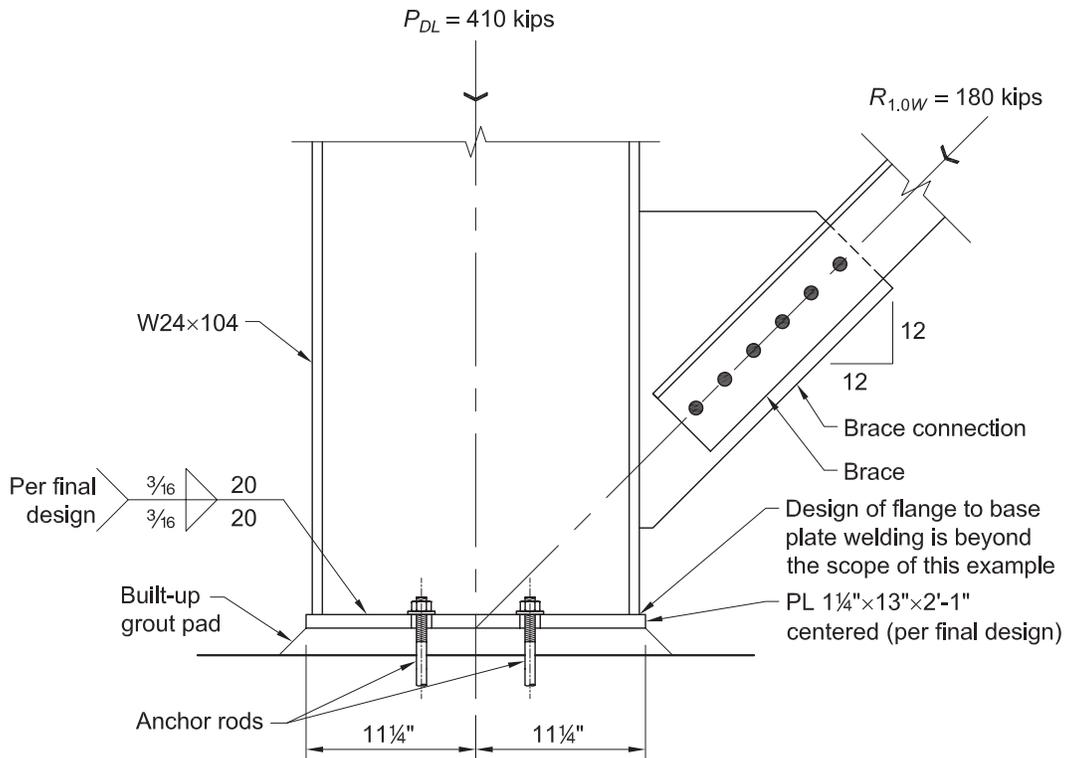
Base connection elevation view detailed in Example 4.7-8.
